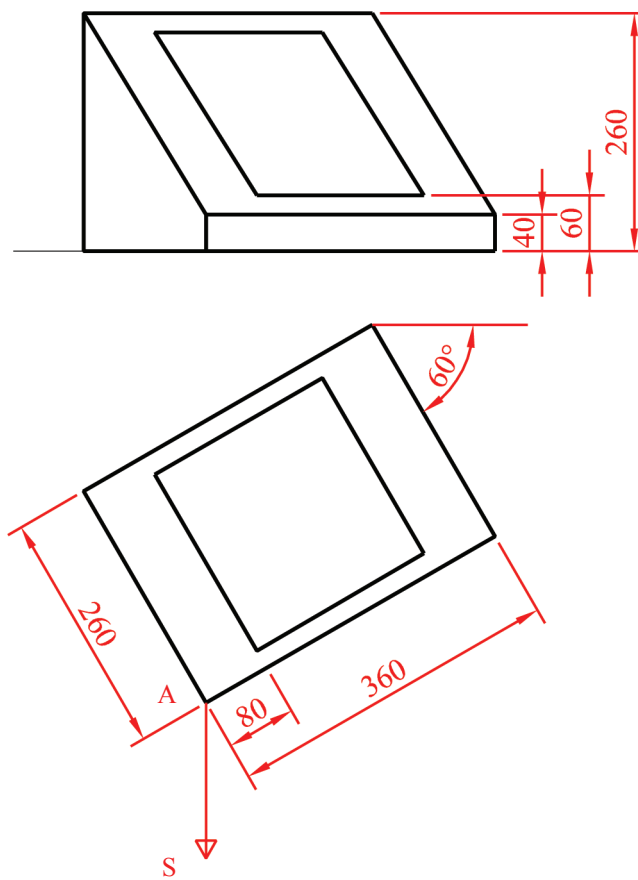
shows the plan and elevation of a portion of the house including the solar panel.
